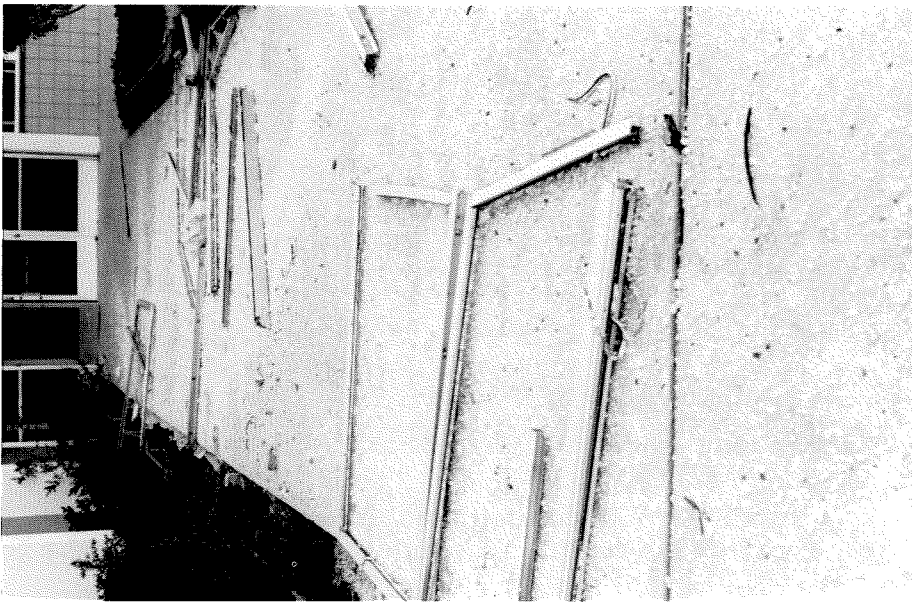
Window frames and shattered safety glass from gymnasium skylight (see following photograph). San Fernando Juvenile Facility.
